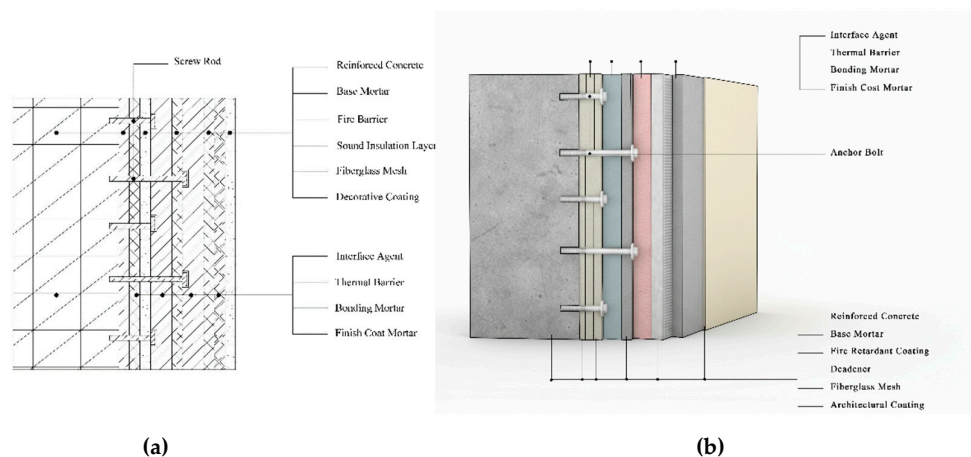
(a) External Wall Envelope Construction (Section Detail). (b) External Wall Envelope Construction (Model).
